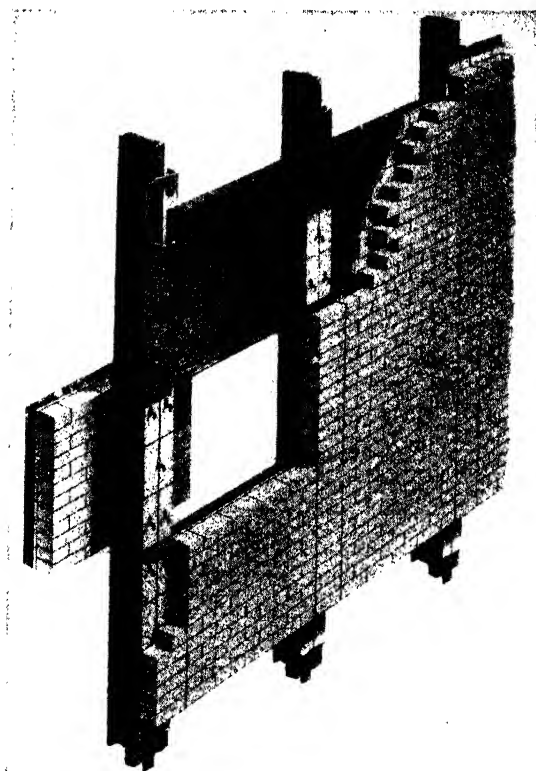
Babcock and Wilcox insulating firebrick panel wall construction.
